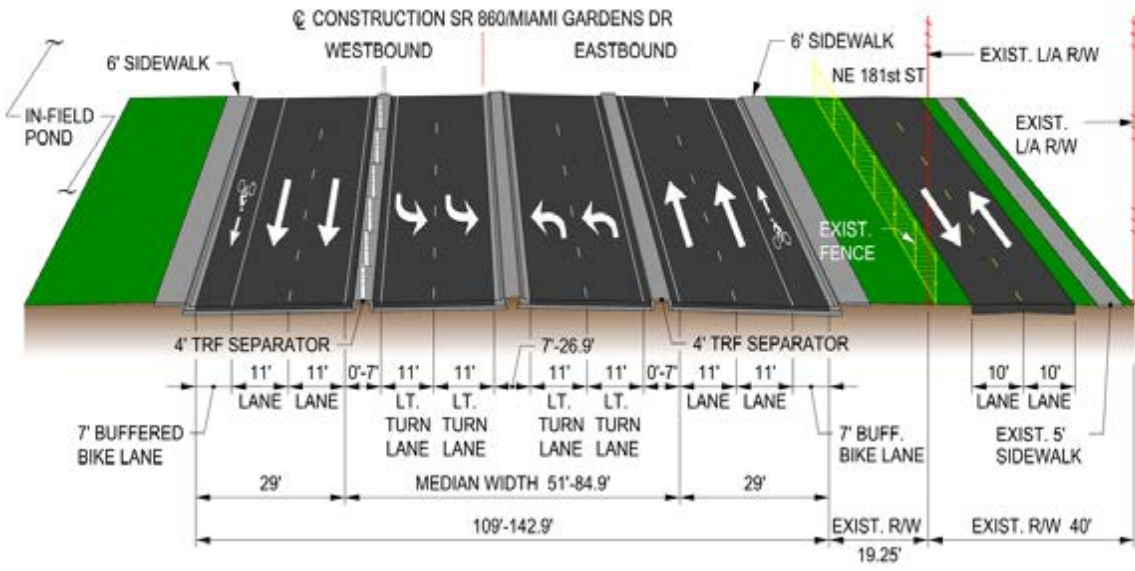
3: Proposed Typical Section - Alternative 1 – SR 860/Miami Gardens Drive
